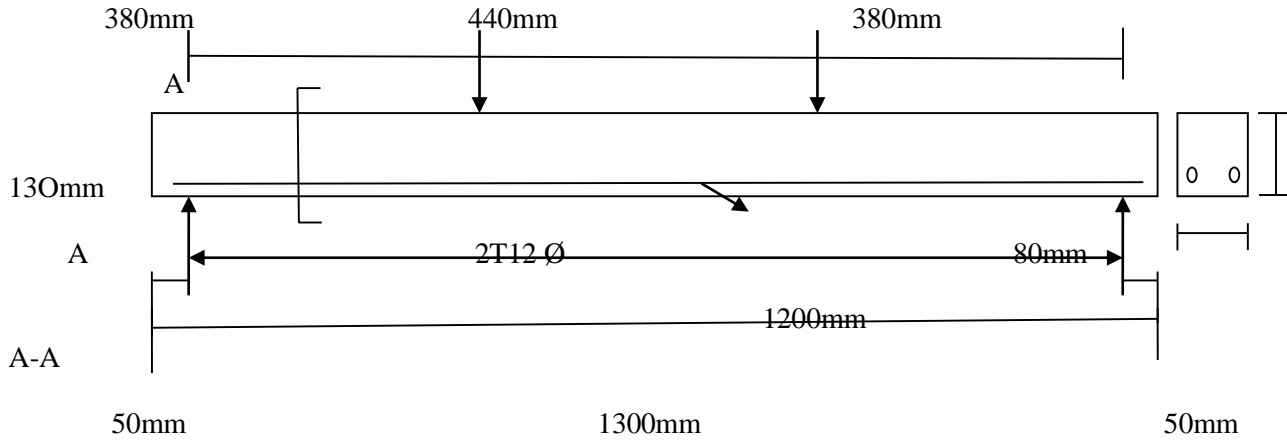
beam 1 - beam without links and poor anchorage of longitudinal reinforcement.
